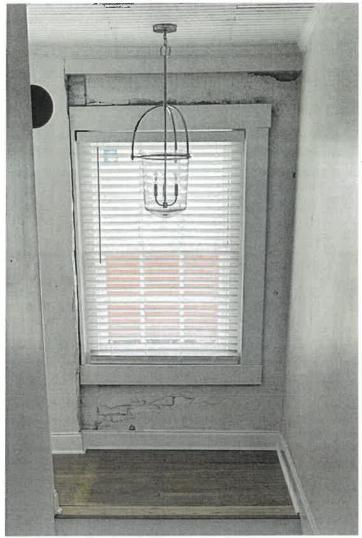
Plaster and sheet rock walls at third floor, looking west
